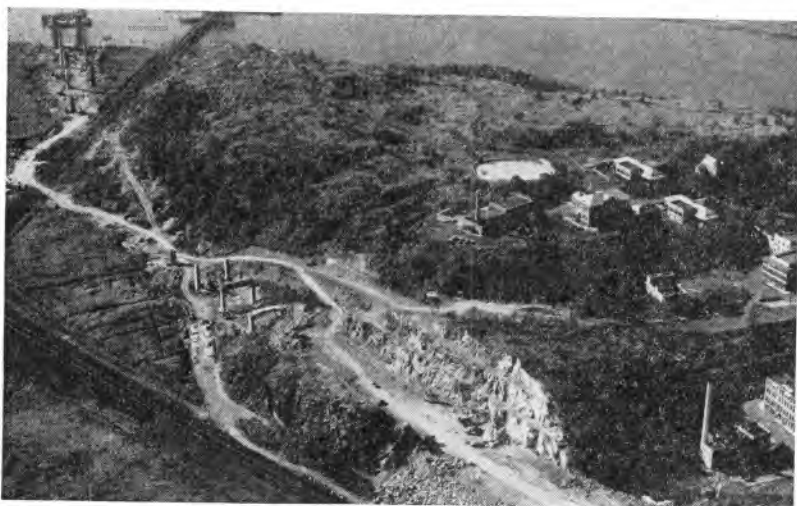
More than 30,000 cubic yards of rock were removed from Laurel Hill in Hudson County. To the left and top can be seen approach piers constructed to carry Turnpike traffic to the bridge crossing over the Hackensack River.
